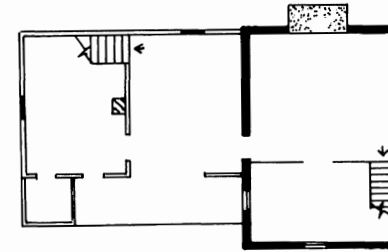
Thomas-Beam House Plan. Early 19th century hall-parlor plan with characteristic late 19th century, two-room ell, with porch and pantry.
